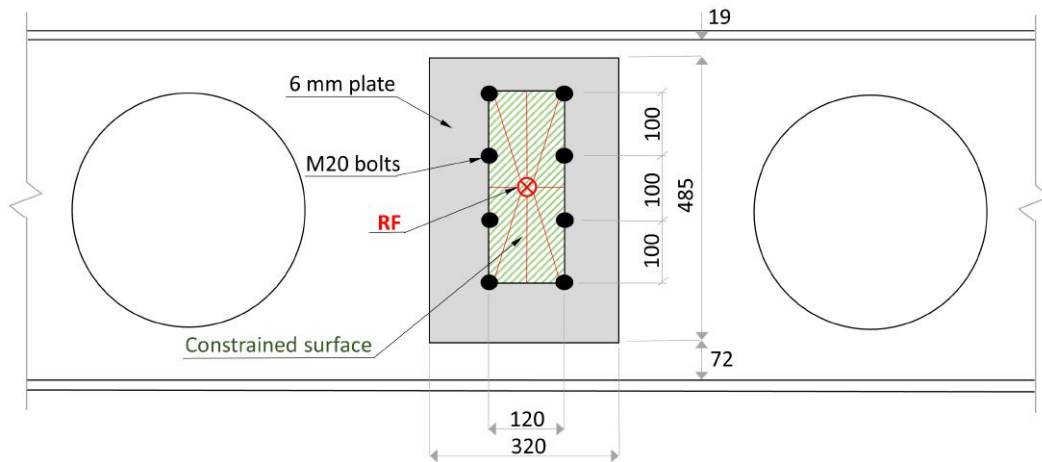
Reference point (RF) and constrained surface used to model the P-beam to column connection
